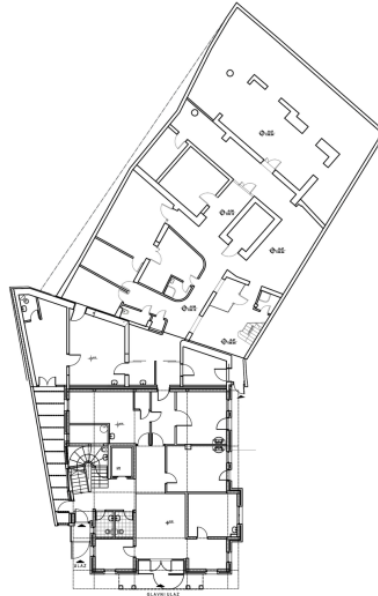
Ground floor elevation of the old building (southern part) and the new building (northern part)
